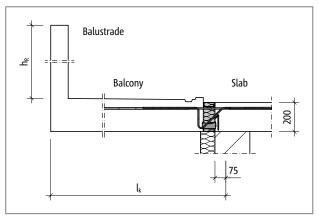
Schöck Isokorb® T type K-E, K-T with type H: Static system, layout
